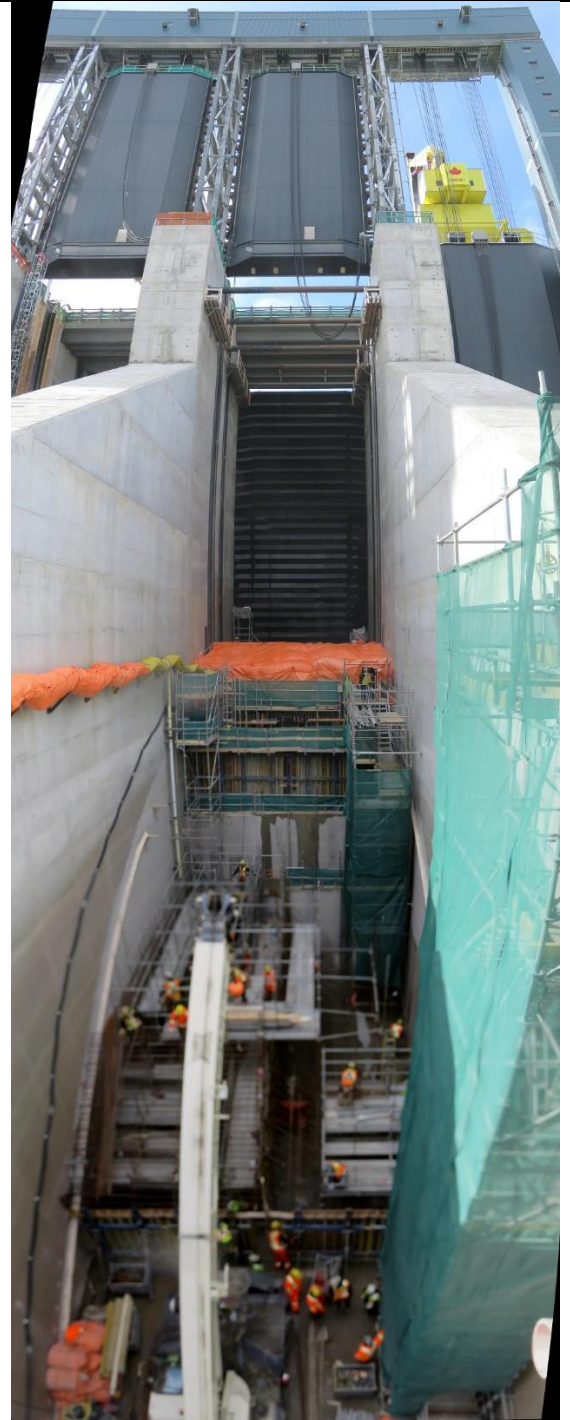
Upstream view of rollway construction in spillway bay 4.
